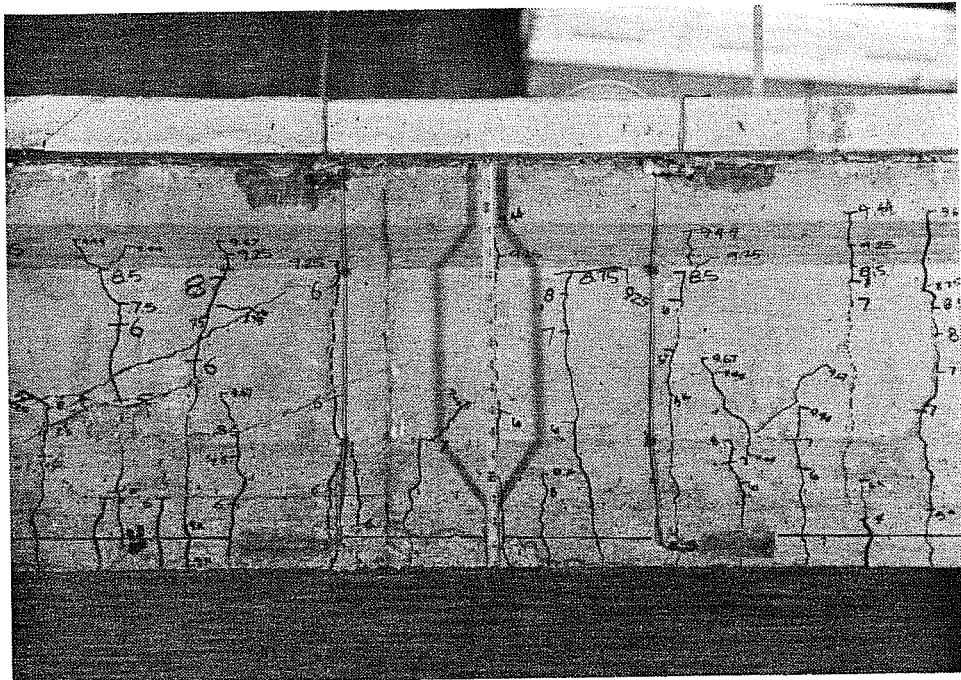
Photograph of extent of cracking of top flange prior to flexural failure - Specimen 2
